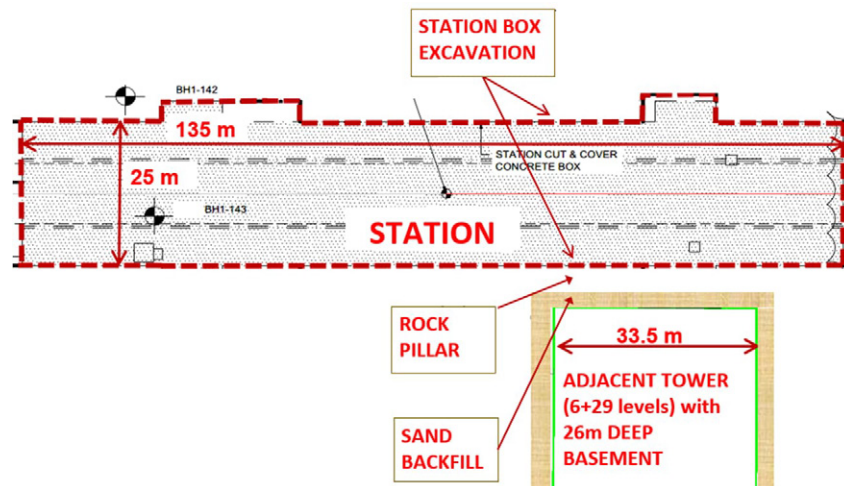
Layout (not to scale) – Station excavation, adjacent tower, sand backfill and rock pillar
